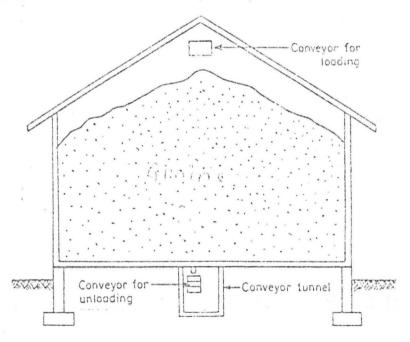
Cross section of a ware house showing conveyors for loading and unloading.
